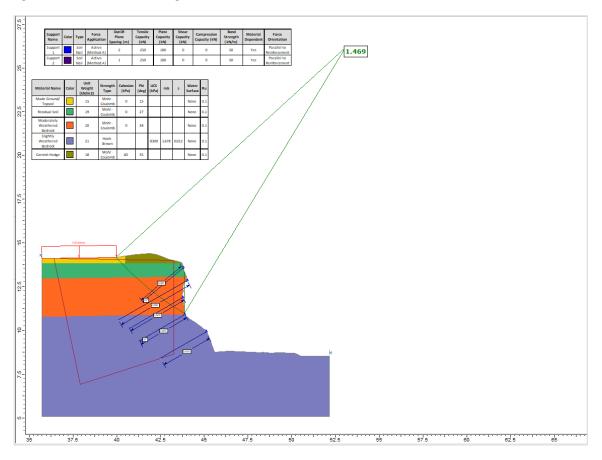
Section 3 – Facing Installation - BS8006 Set1
